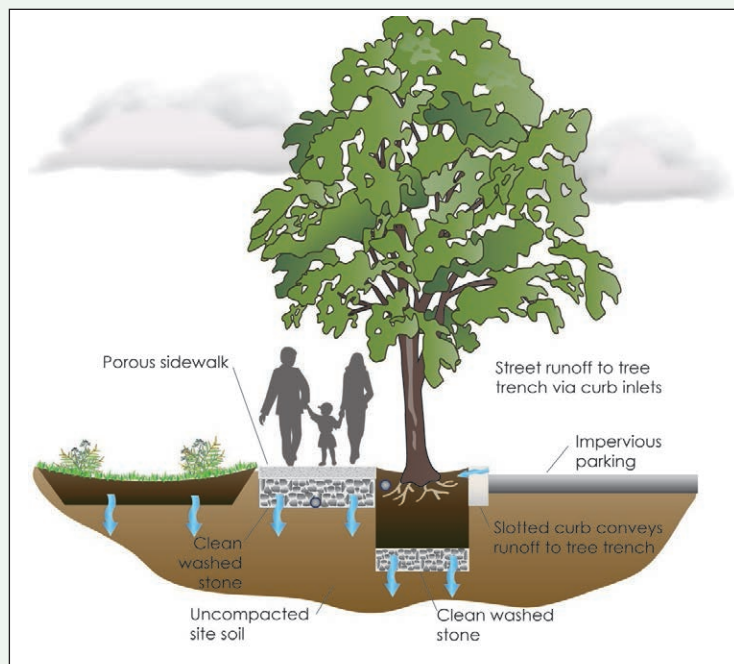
Tree box with contributing porous concrete sidewalk – typical illustration
